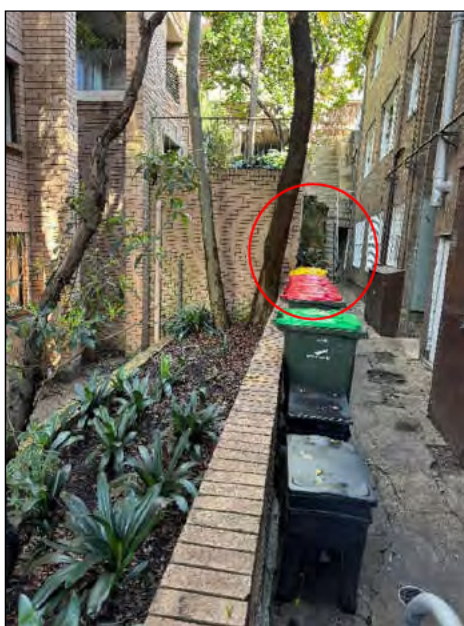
View looking south-west between 21C Billyard Avenue (left side) and 21B Billyard Avenue (right side).
